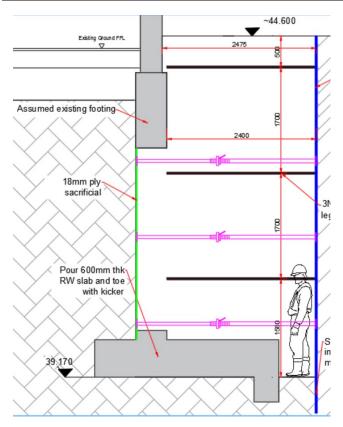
Installation of excavation support (LHS) and formwork for concrete pour (RHS)
